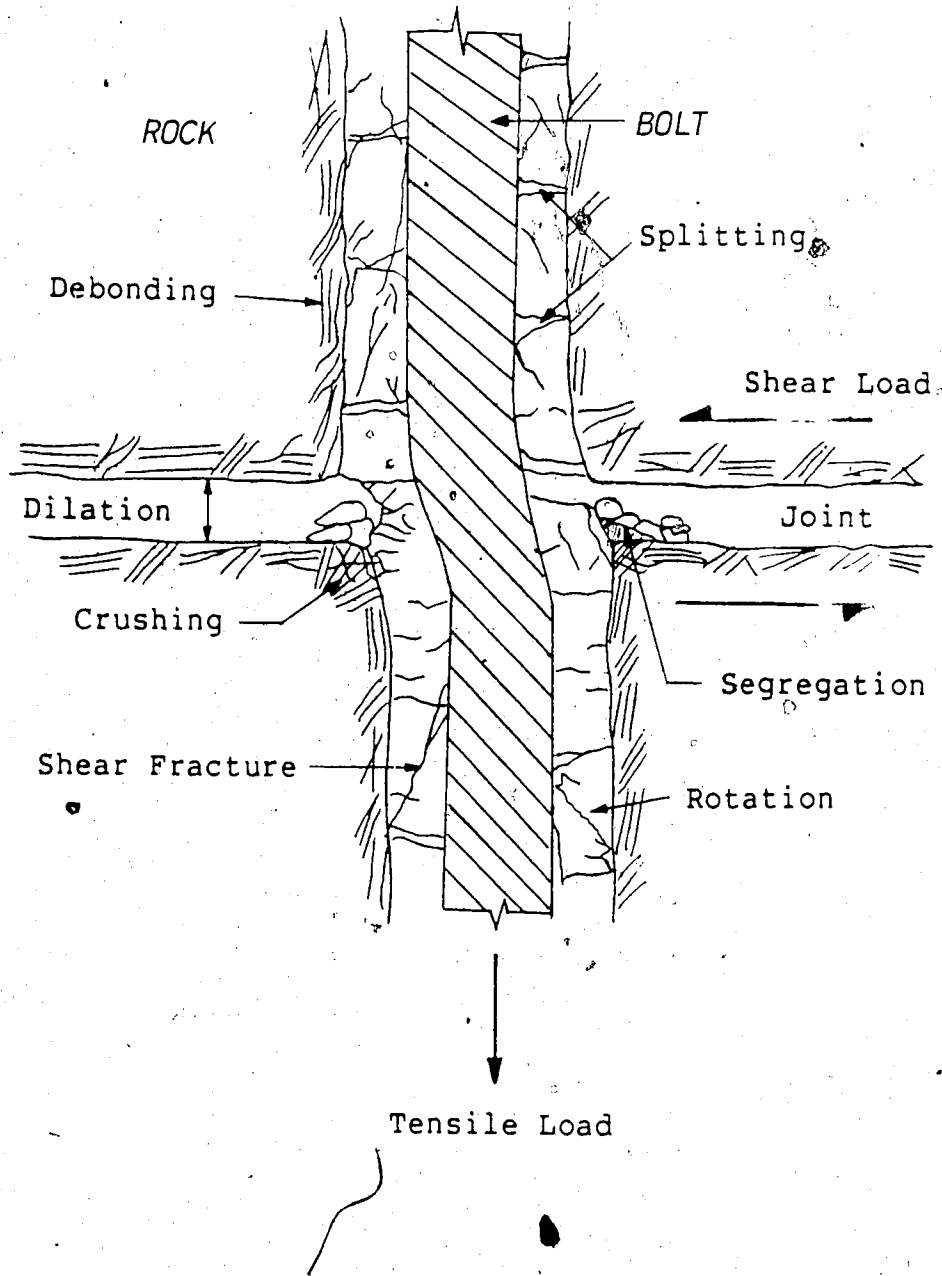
Shear Deformation of a Fully Grouted Bolt
